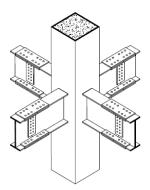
Combination of square concrete-filled tubular column with steel beams.
